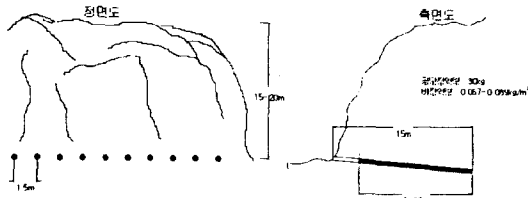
Blasting pattern design(φ75 mm, 연암).
